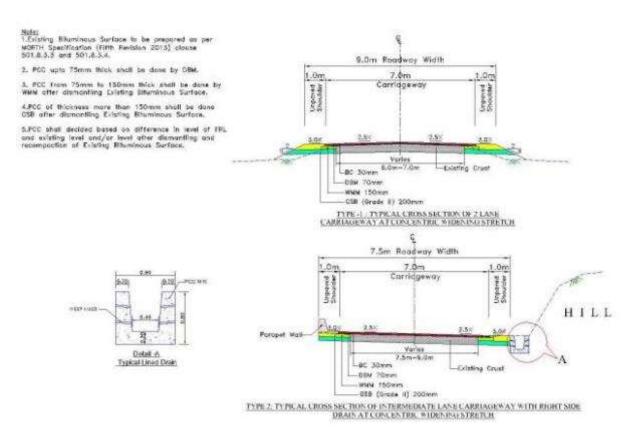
Typical Cross-Section of 2 Lane and intermediate Lane carriageway with Right side drain at concentric widening Stretch
